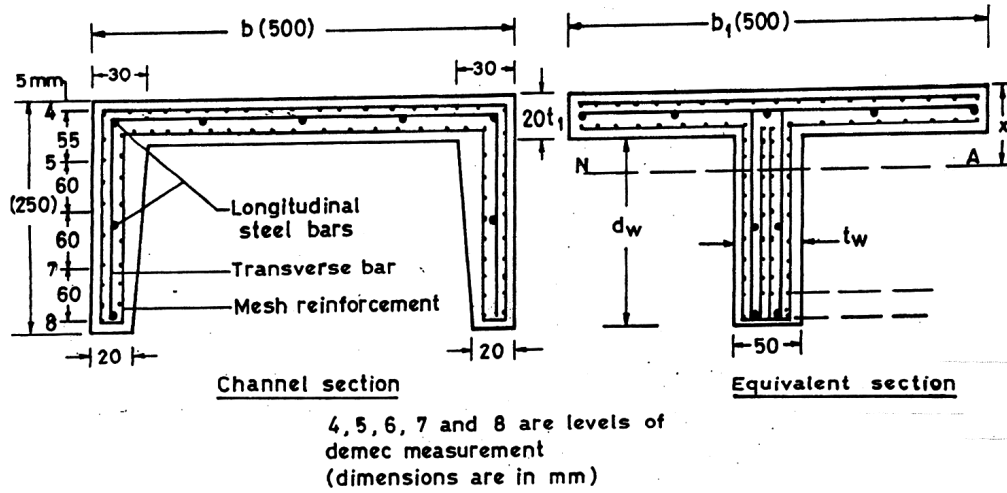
Channel type floor elements – Actual cross-section and its equivalent section.
